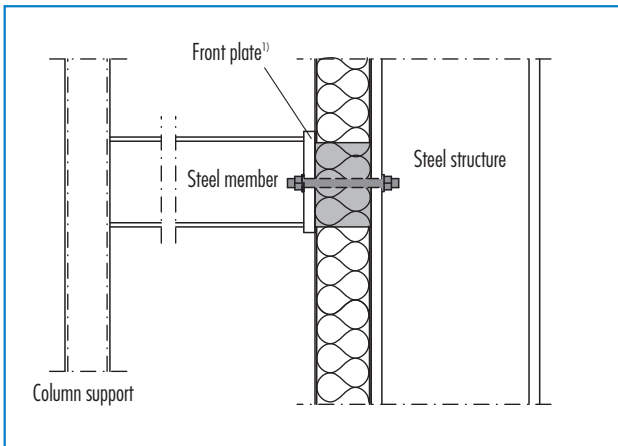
Schöck Isokorb® module, type KST-QST/KST-ZQST for supported steel structures
